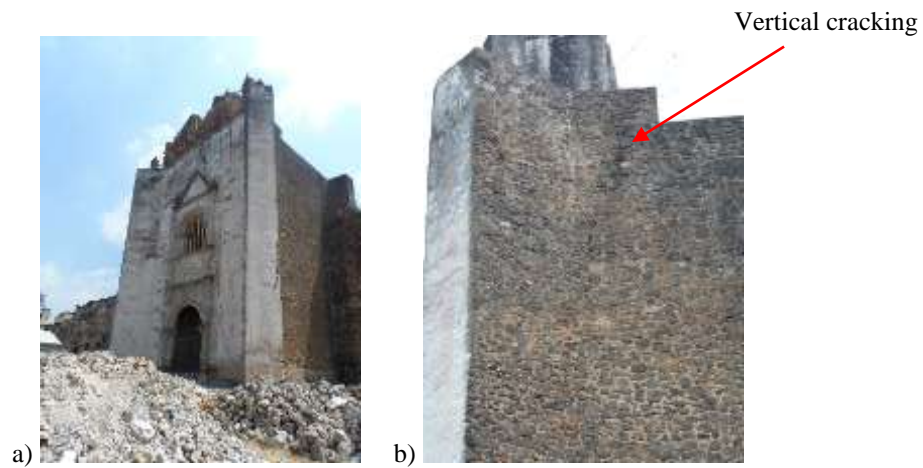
Facade of the Tlayacapan temple, Morelos: a) General view; b) Vertical cracking between the facade and the wall of the nave
